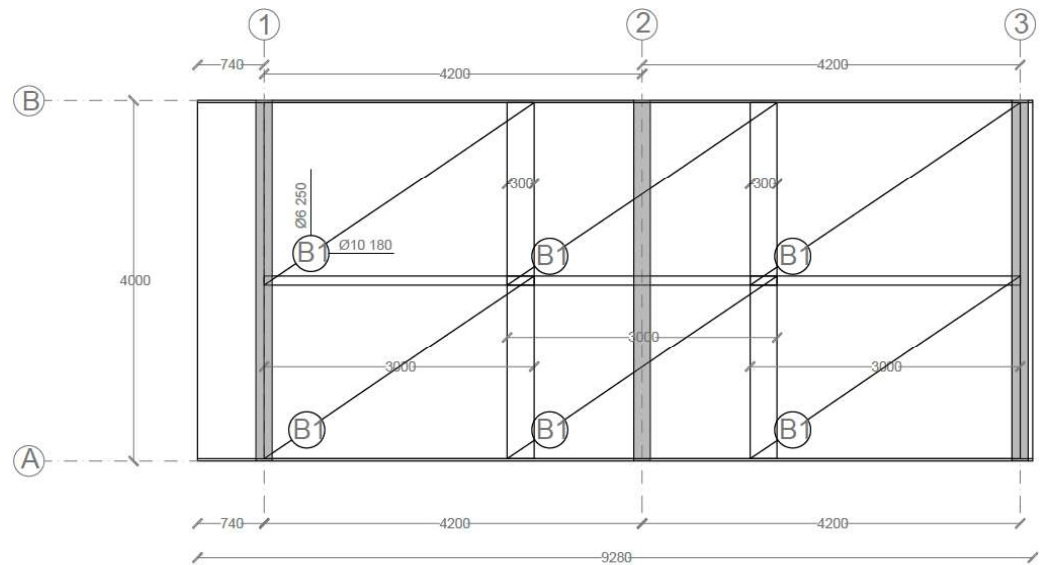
Horizontal section of the EUC-BUILD-3 specimen including the lower reinforcement layer (B1 in the figure) and the rebar overlap adopted for the lower rebars; adapted from [Brunesi et al, 2017].
